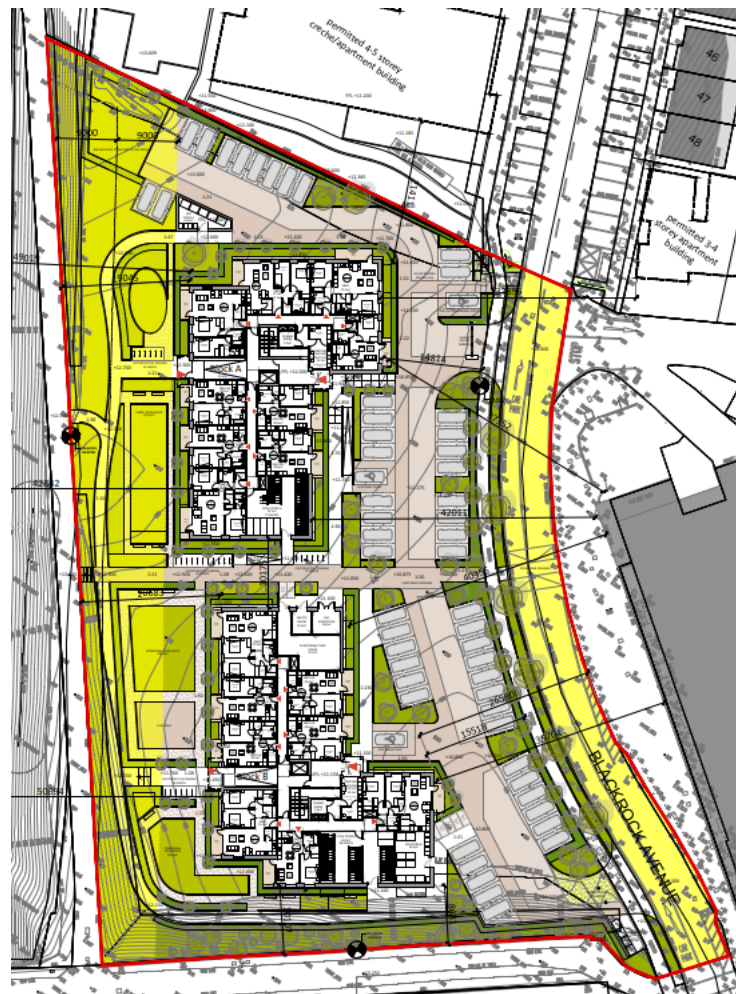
Proposed Site Layout Plan Prepared by O'Mahony Pike Architecture
